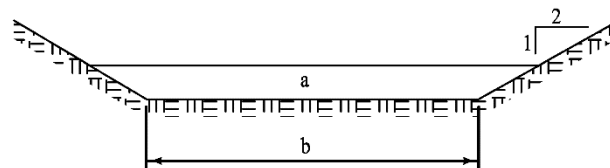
E-12.03: Typical Sediment Basin Emergency Spillway
